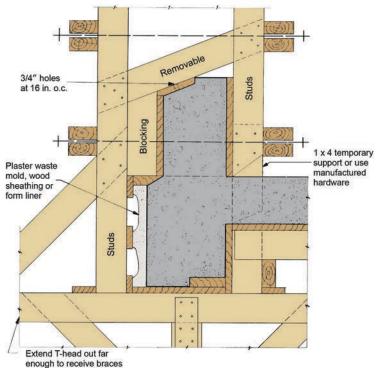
Ornamental spandrel beam form design suitable for casting in two stages because face design would tend to hide construction joint at the top of the floor slab (Image courtesy Portland Cement Association)
